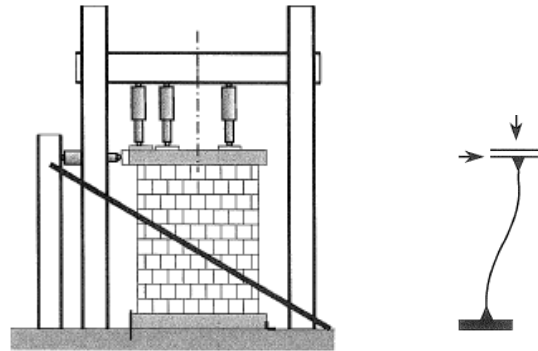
Structural system of the test-setup (Jaeger and Schöps 2004) and structural model which was used to calibrate the FE-Software
